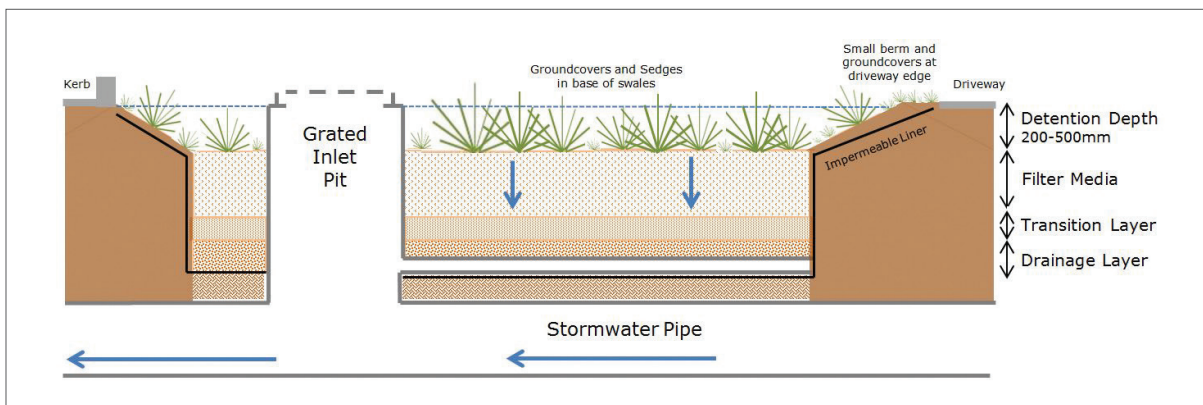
Indicative Long Section, Road Side Biofiltration Swale
